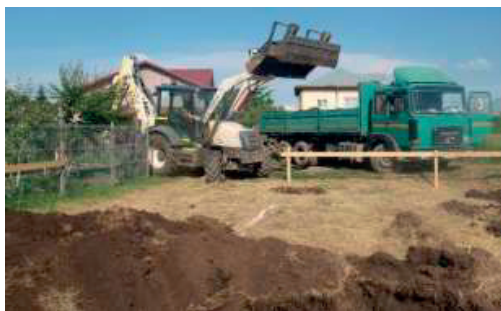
The excavated soil is transported from the place prepared for the construction of the building in the residential area
